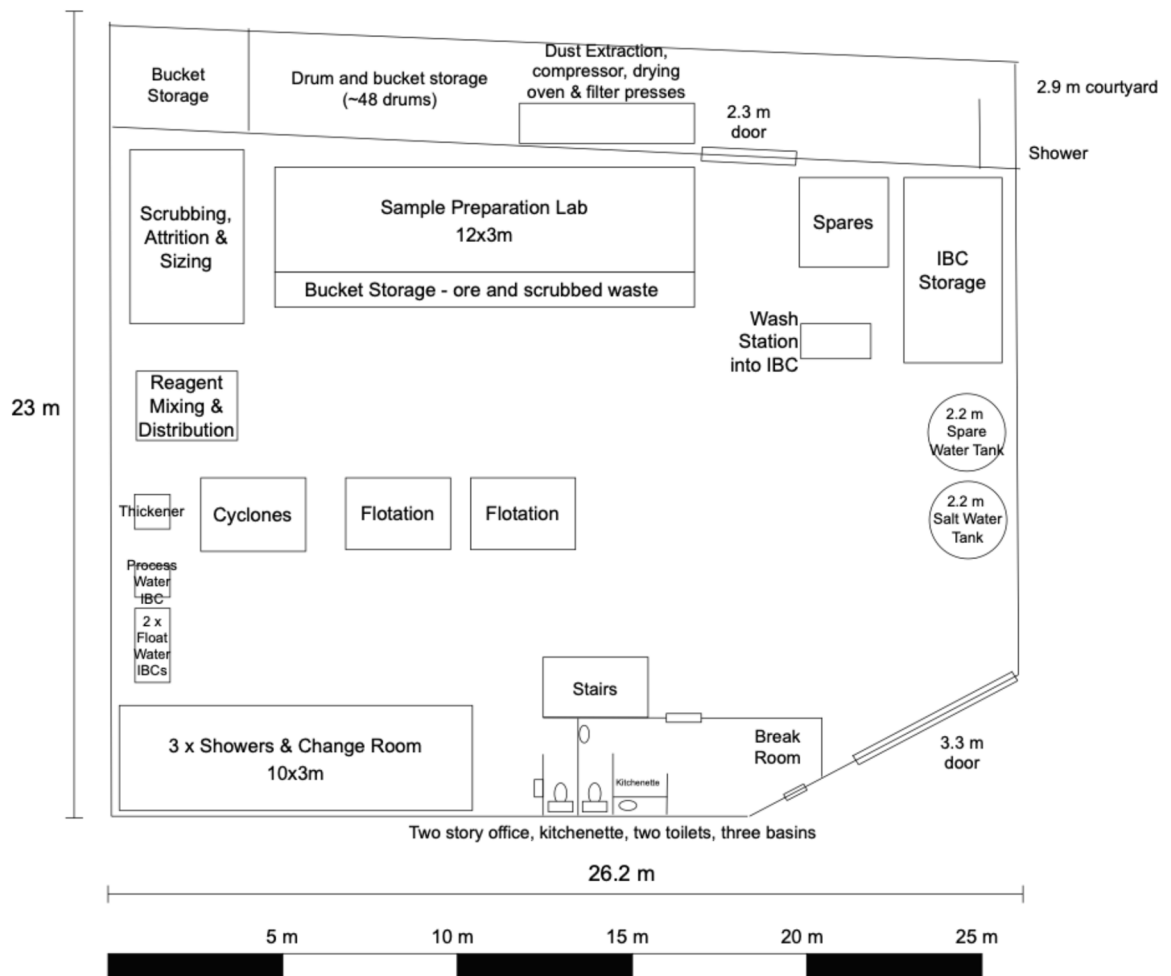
Layout of Demonstration Plant in hall 1 at Bohrstreet, Swakopmund
